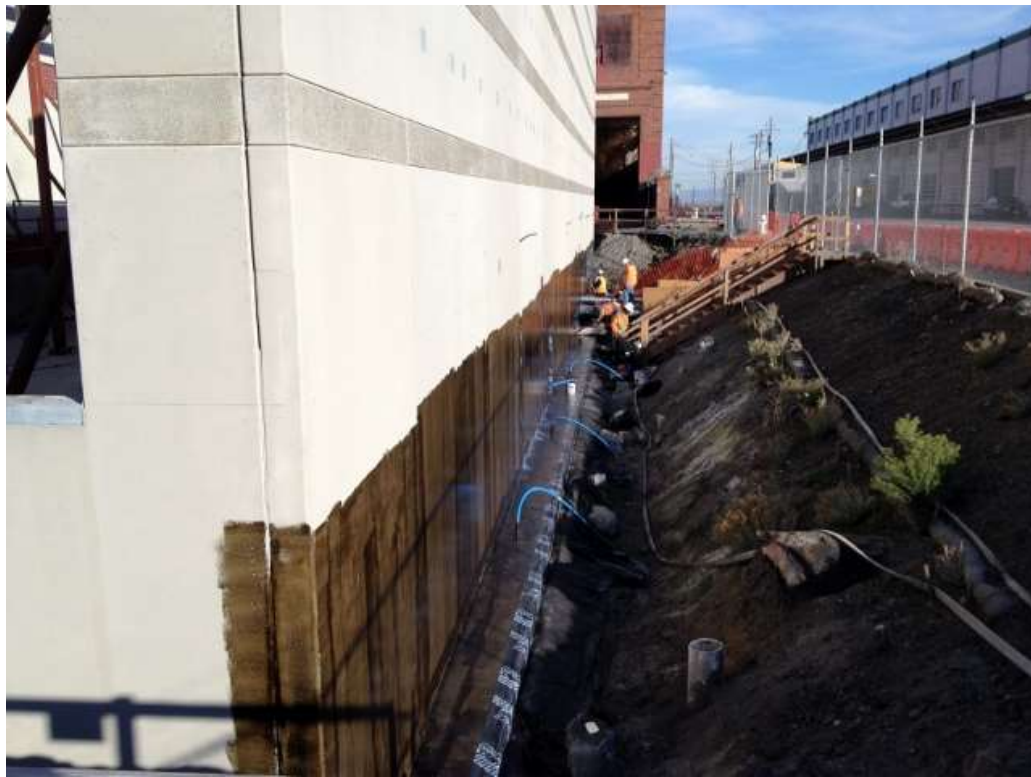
Crew waterproofing outside of GIS building in Potrero Switchyard. View east, December 1, 2015.
